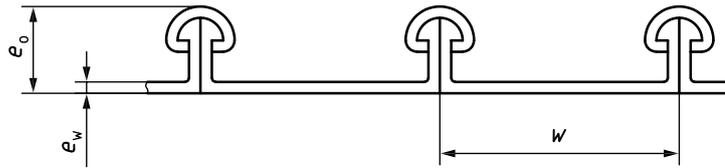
Example of studded PE sheet with double hot wedge welded seam
